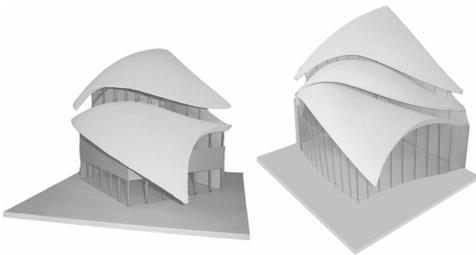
Models made for the tender of 'The Library' and 'The Great Hall'.
